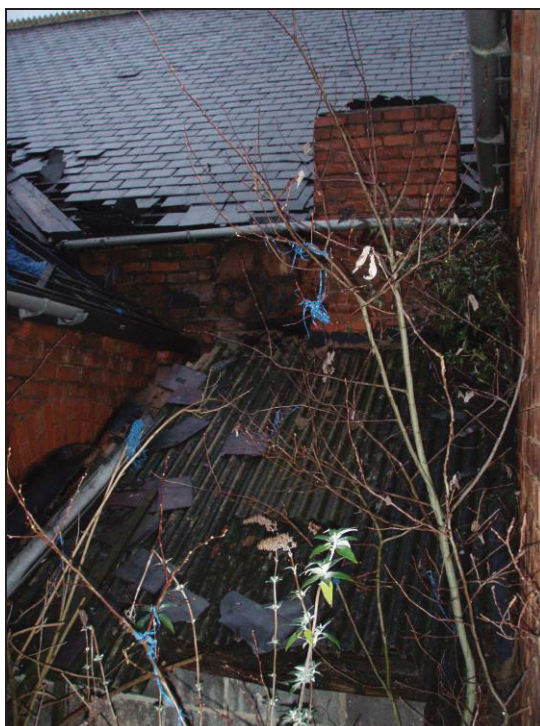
View from the doorway overlooking the boiler room (note chimney).
